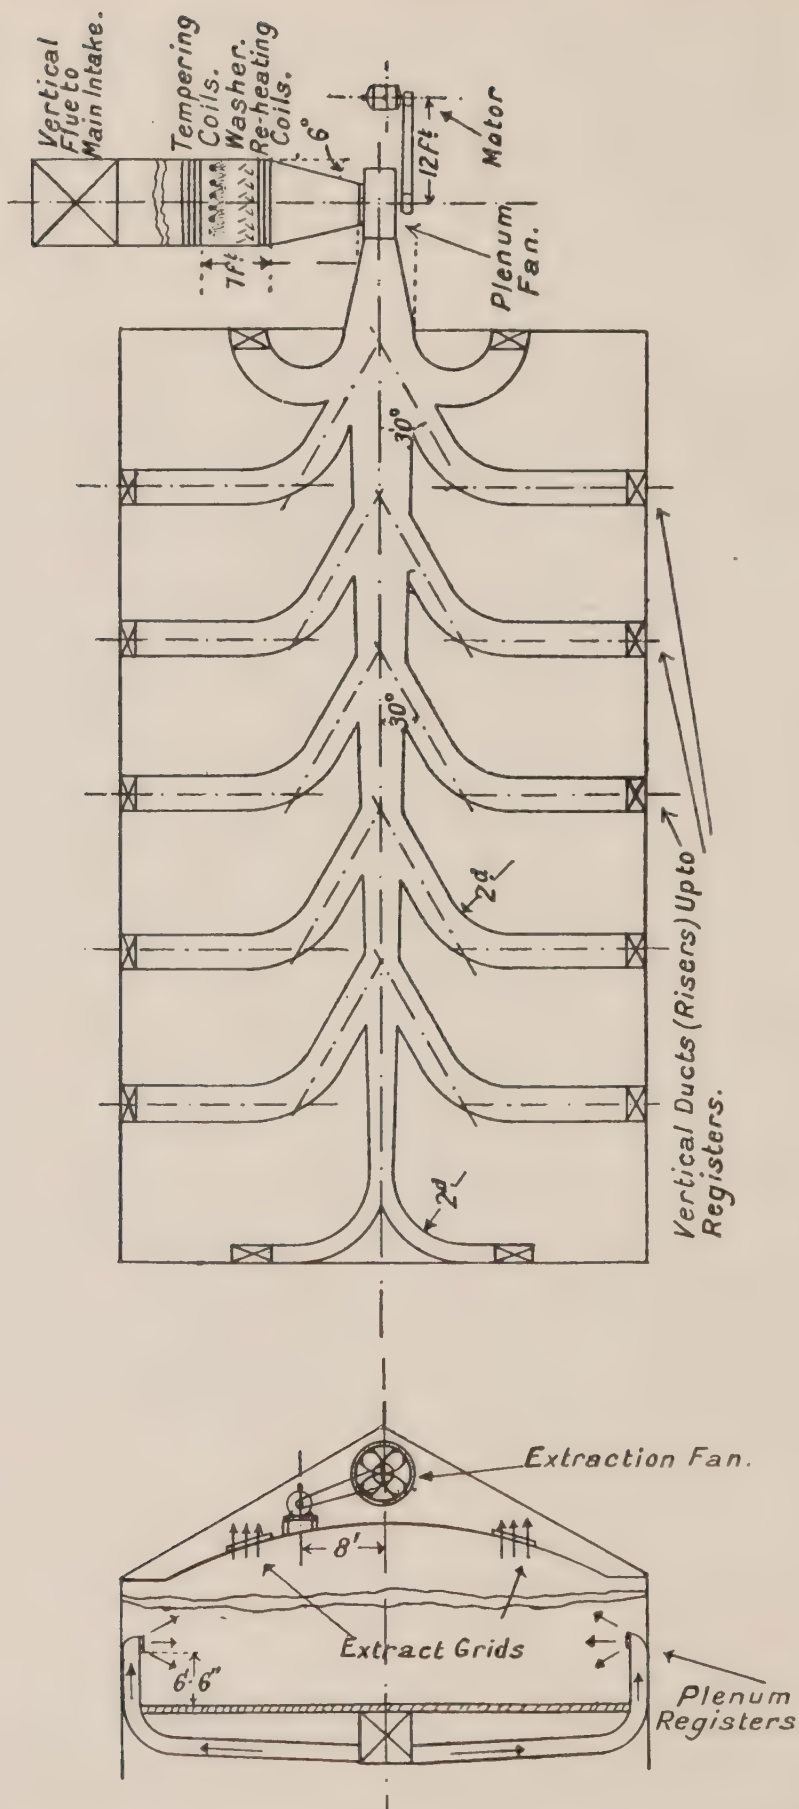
Model Design of Ventilating Installation on the Balanced System.
